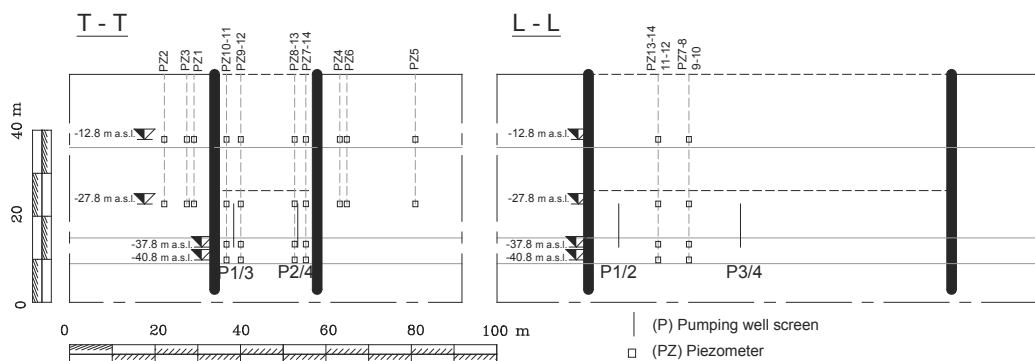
Cross and longitudinal section of station shaft with layout of monitoring system for the dewatering trial test.
